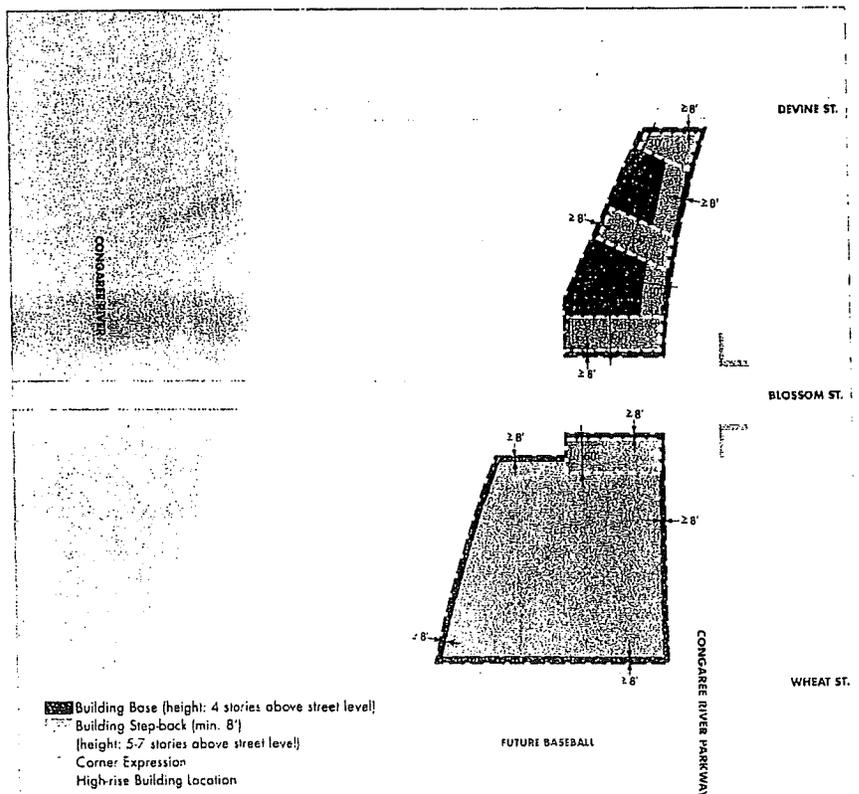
BLOSSOM STREET GATEWAY BUILDING ENVELOPE
